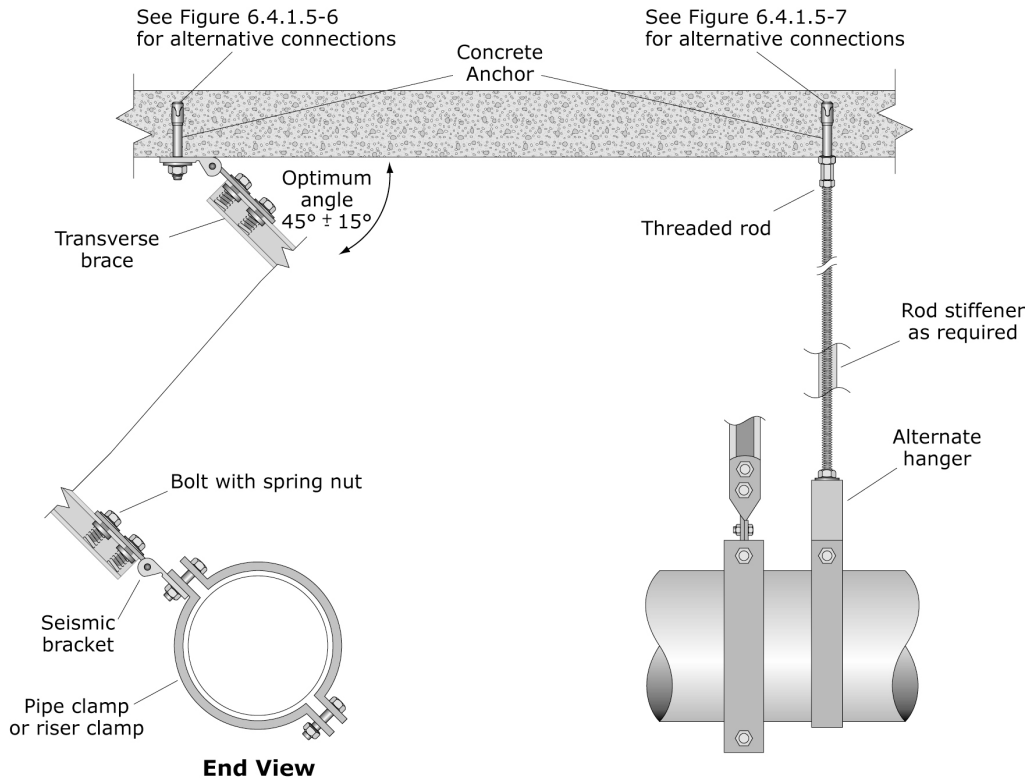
Rigid bracing - single pipe alternate transverse (ER).
